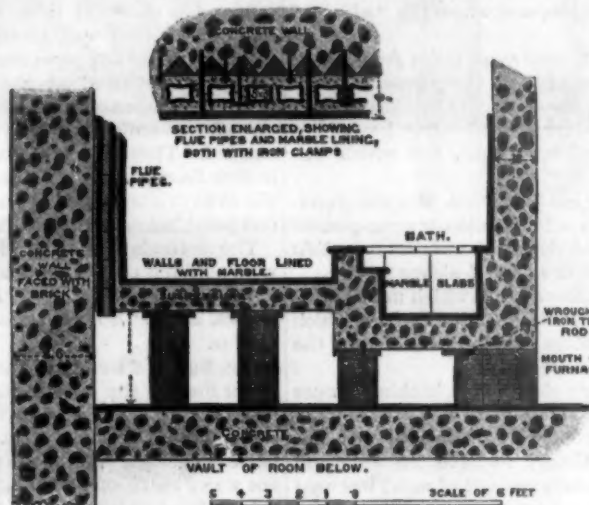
SECTION OF A PRIVATE BATHROOM IN THE ATRIUM VESTAE.
